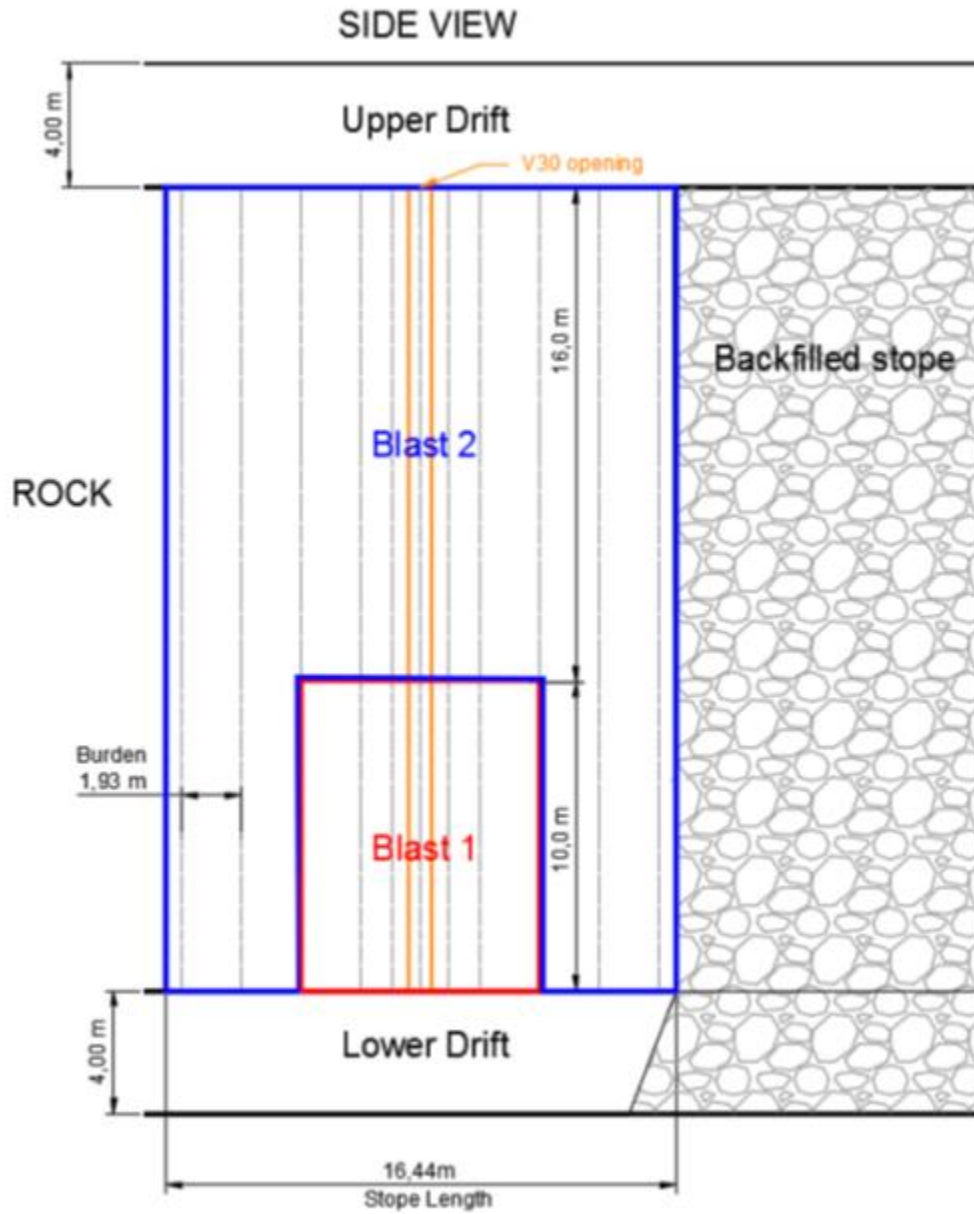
Typical drilling configuration for Valley Zone, side view
